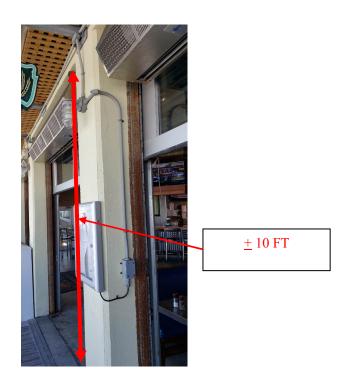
Location 27: Approximately 10 ft long new 16x12 concrete column. See detail 6/S104.
